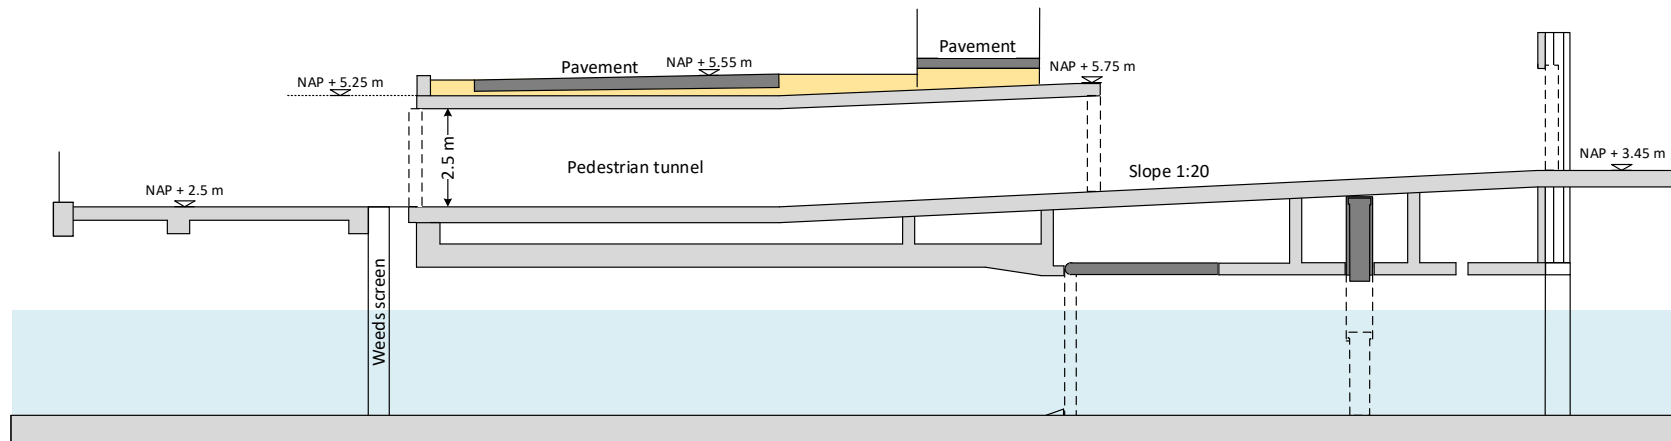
Side view of the resulting design for culvert number 2. The river side is at the right side of figure. New elements: pedestrian tunnel floor and road, heightened pavement, opening wall at river side, the gates in the culvert and the 3 gates in the pedestrian tunnel.
